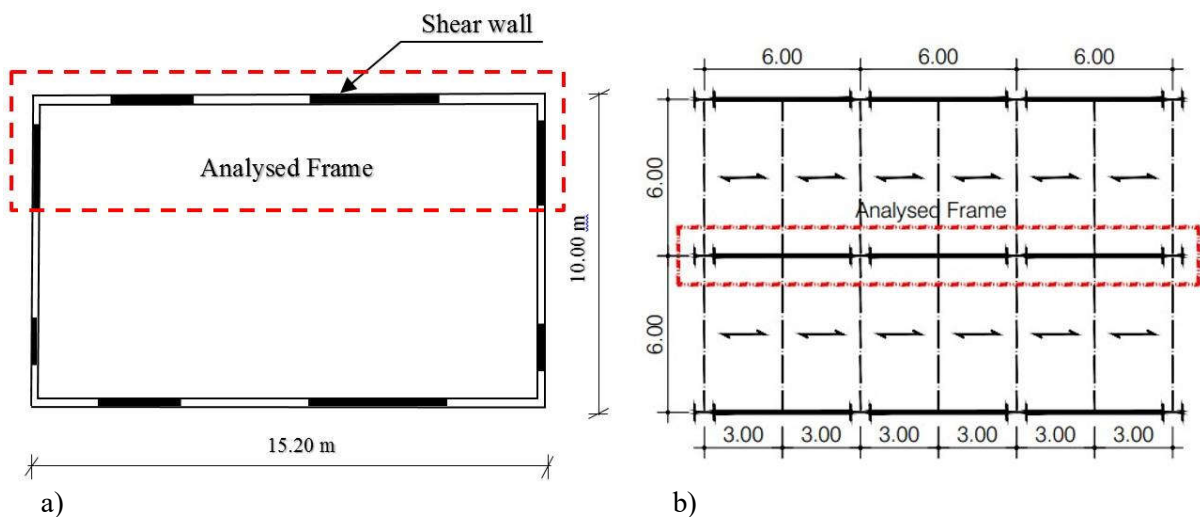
Plan views of: a) CFS-SWP and b) MRF buildings.
